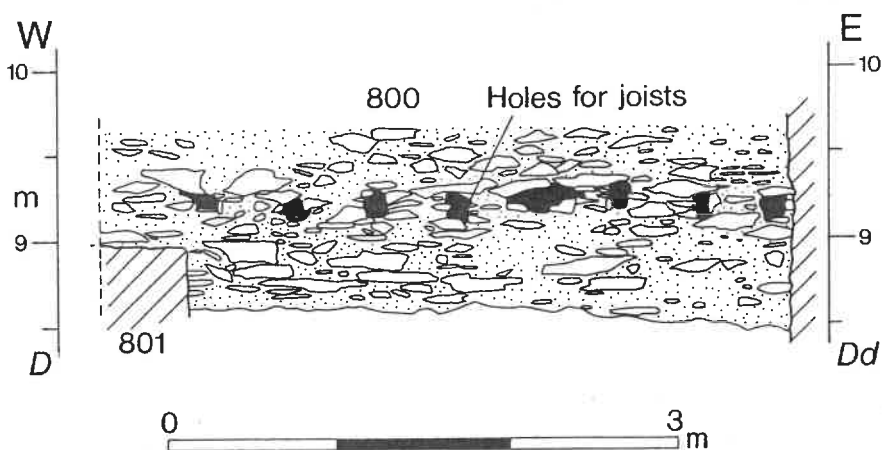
Amlwch, New Haven. Details of holes for floor joists in wall 800.
